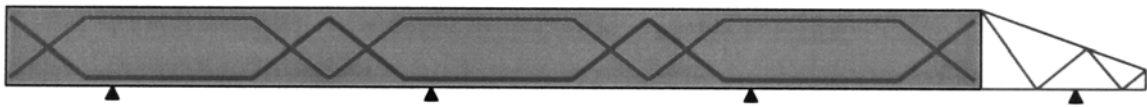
Orientation of prestressing tendons in a launched prestressed concrete box girder bridge. (Vogel)
